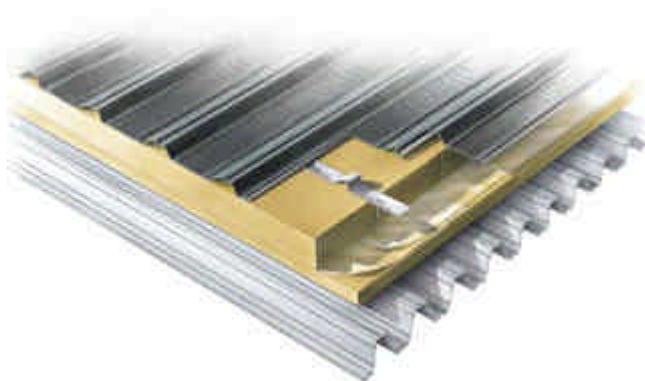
An insulated roof with load bearing profiles for example Plannja 200 or Plannja 111. As surface profile a low Plannja 40 is used, especially developed for low sloping roofs, from 3,6 degrees. (Source: www.plannja.se)
